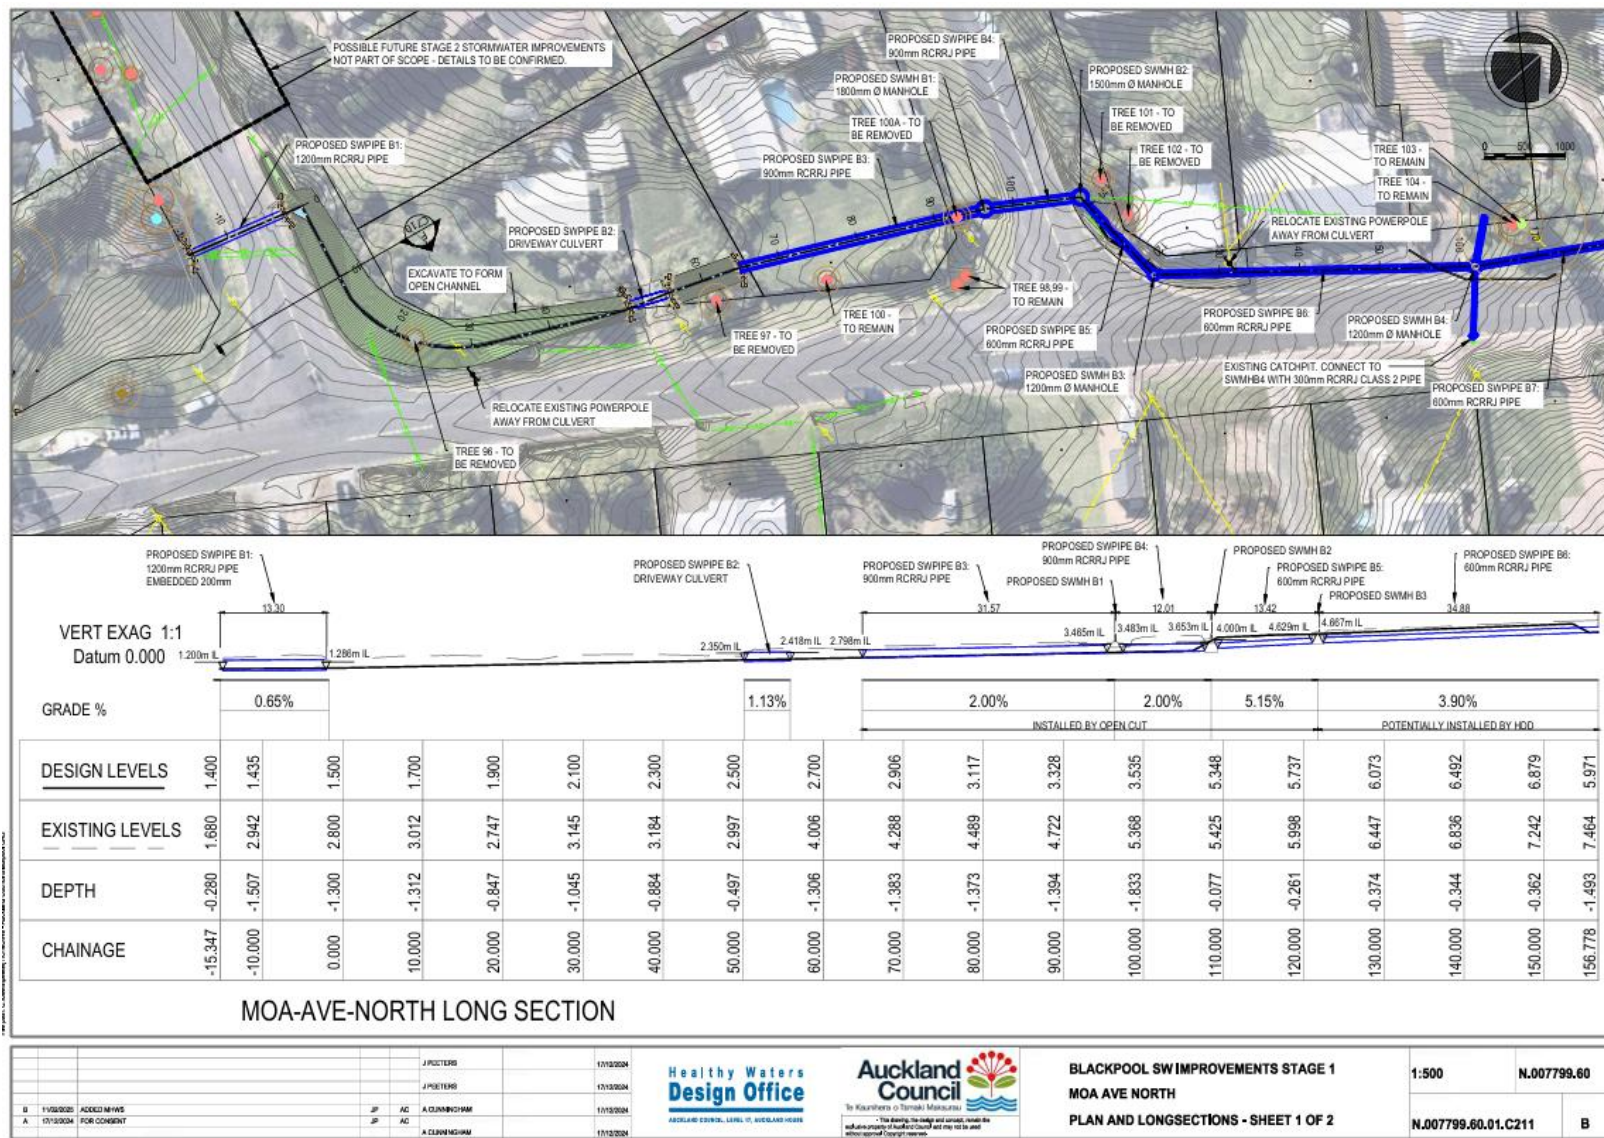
Blackpool SW Improvements Stage 1 Moa Ave North Plan and Longsections – Sheet 1 of 2
